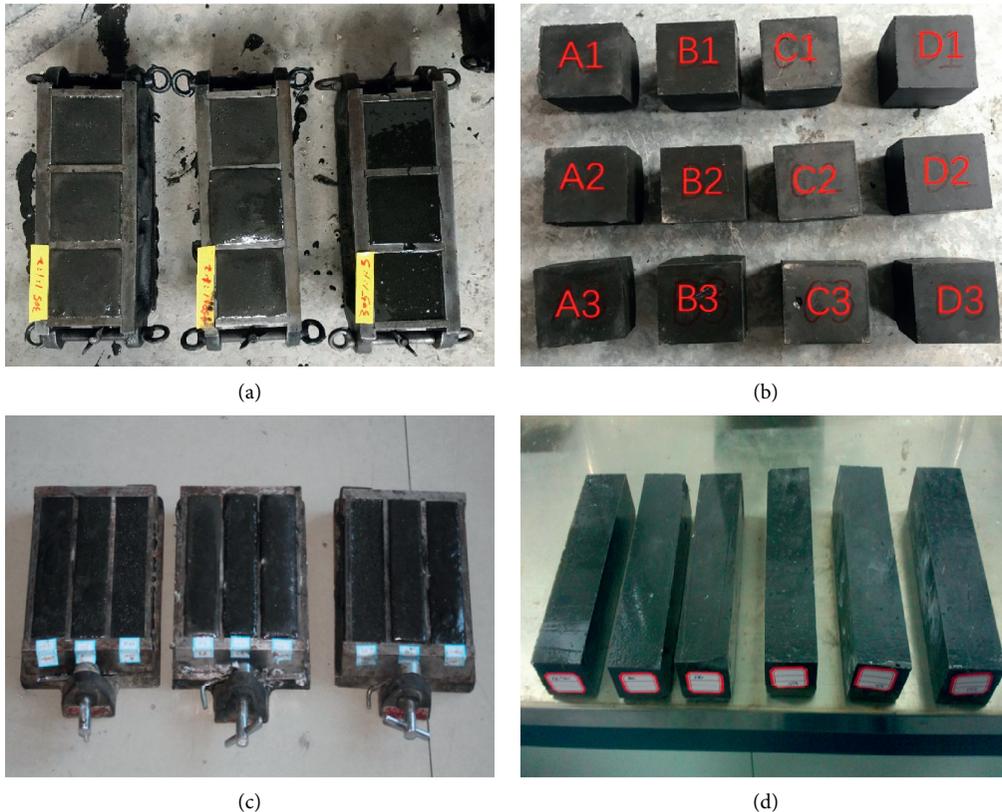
Preparation of polyurethane cement specimens: (a) pouring and curing of compressive specimens, (b) demoulding and numbering of compressive specimens, (c) pouring and curing of flexural specimens, and (d) demoulding and numbering of flexural specimens.
